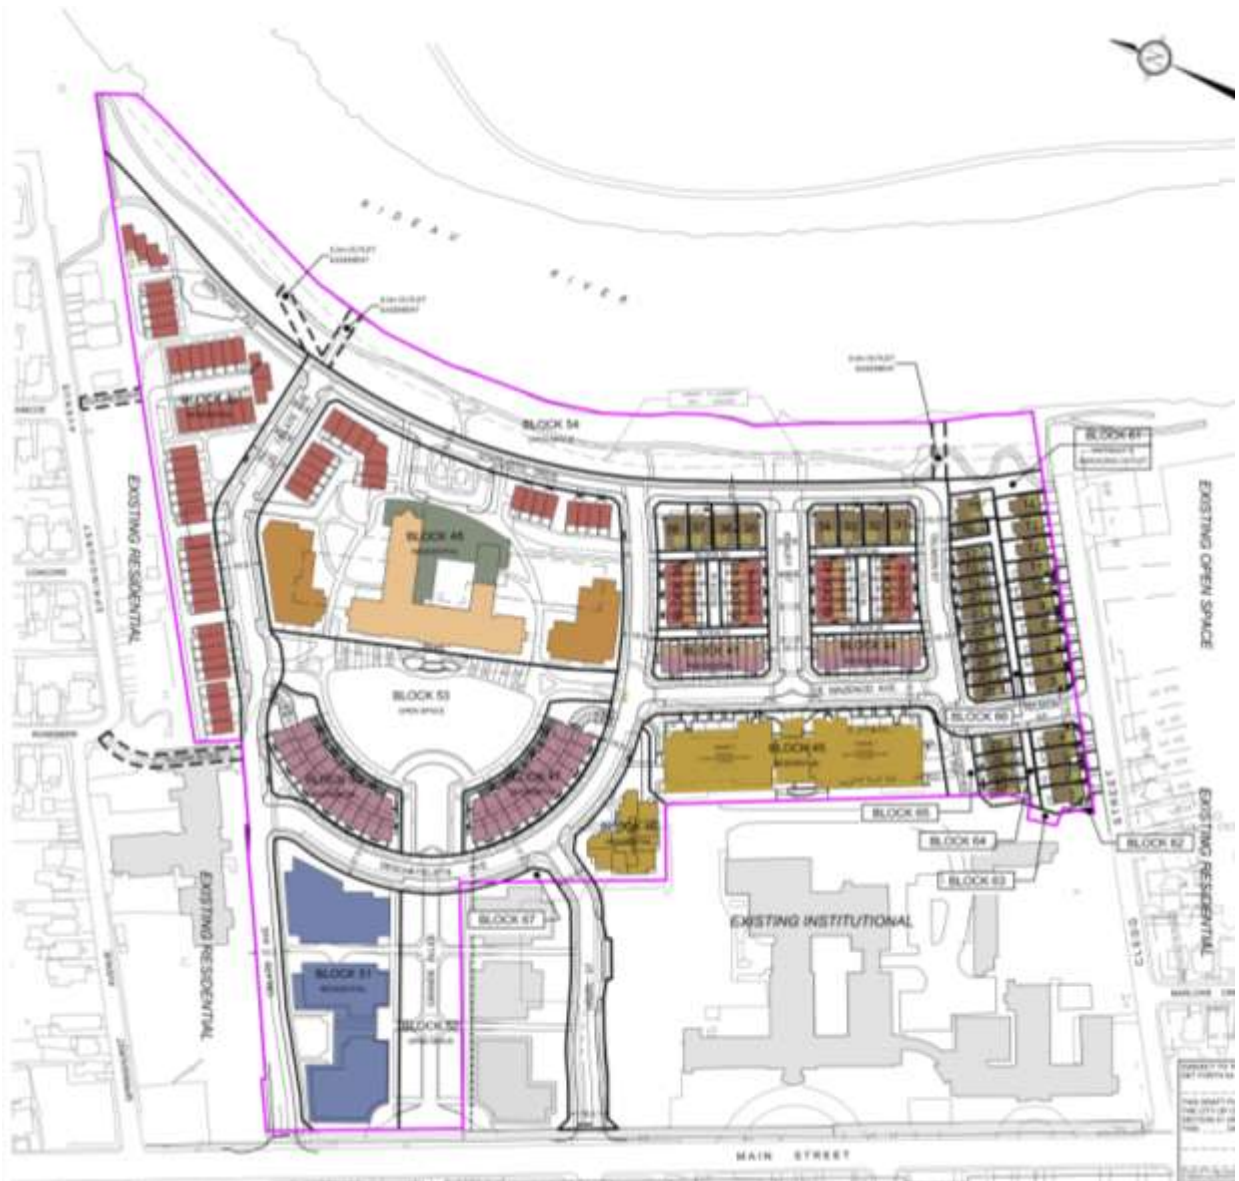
Lot and Block plan of the development site - Greystone Village, Credit: Greystone Village Inc.
